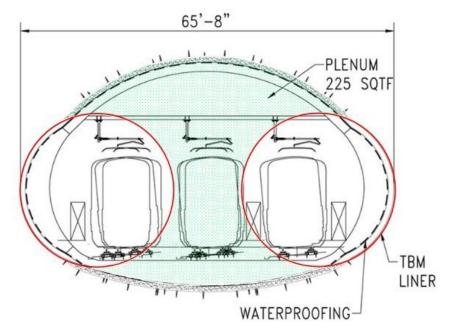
, Example of SEM Mining of Center Area between Two Running Tunnels to Create Space for a Track Crossover Section (TJPA, 2017)
